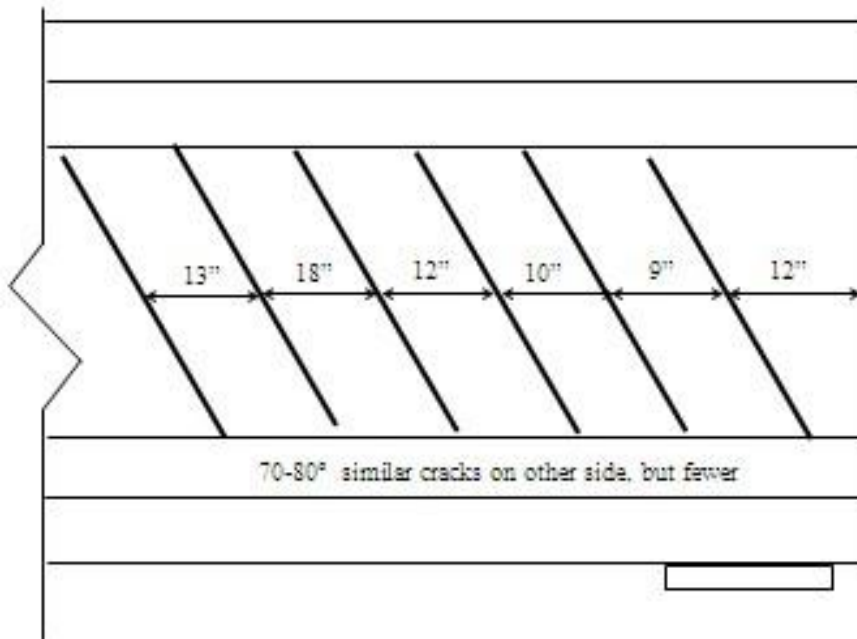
Crack diagram for exterior girder on east side, exterior face, south abutment (#3849).
